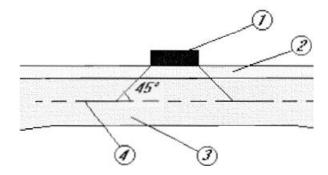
Dispersal of Concentrated Loads through pavement and a concrete slab
